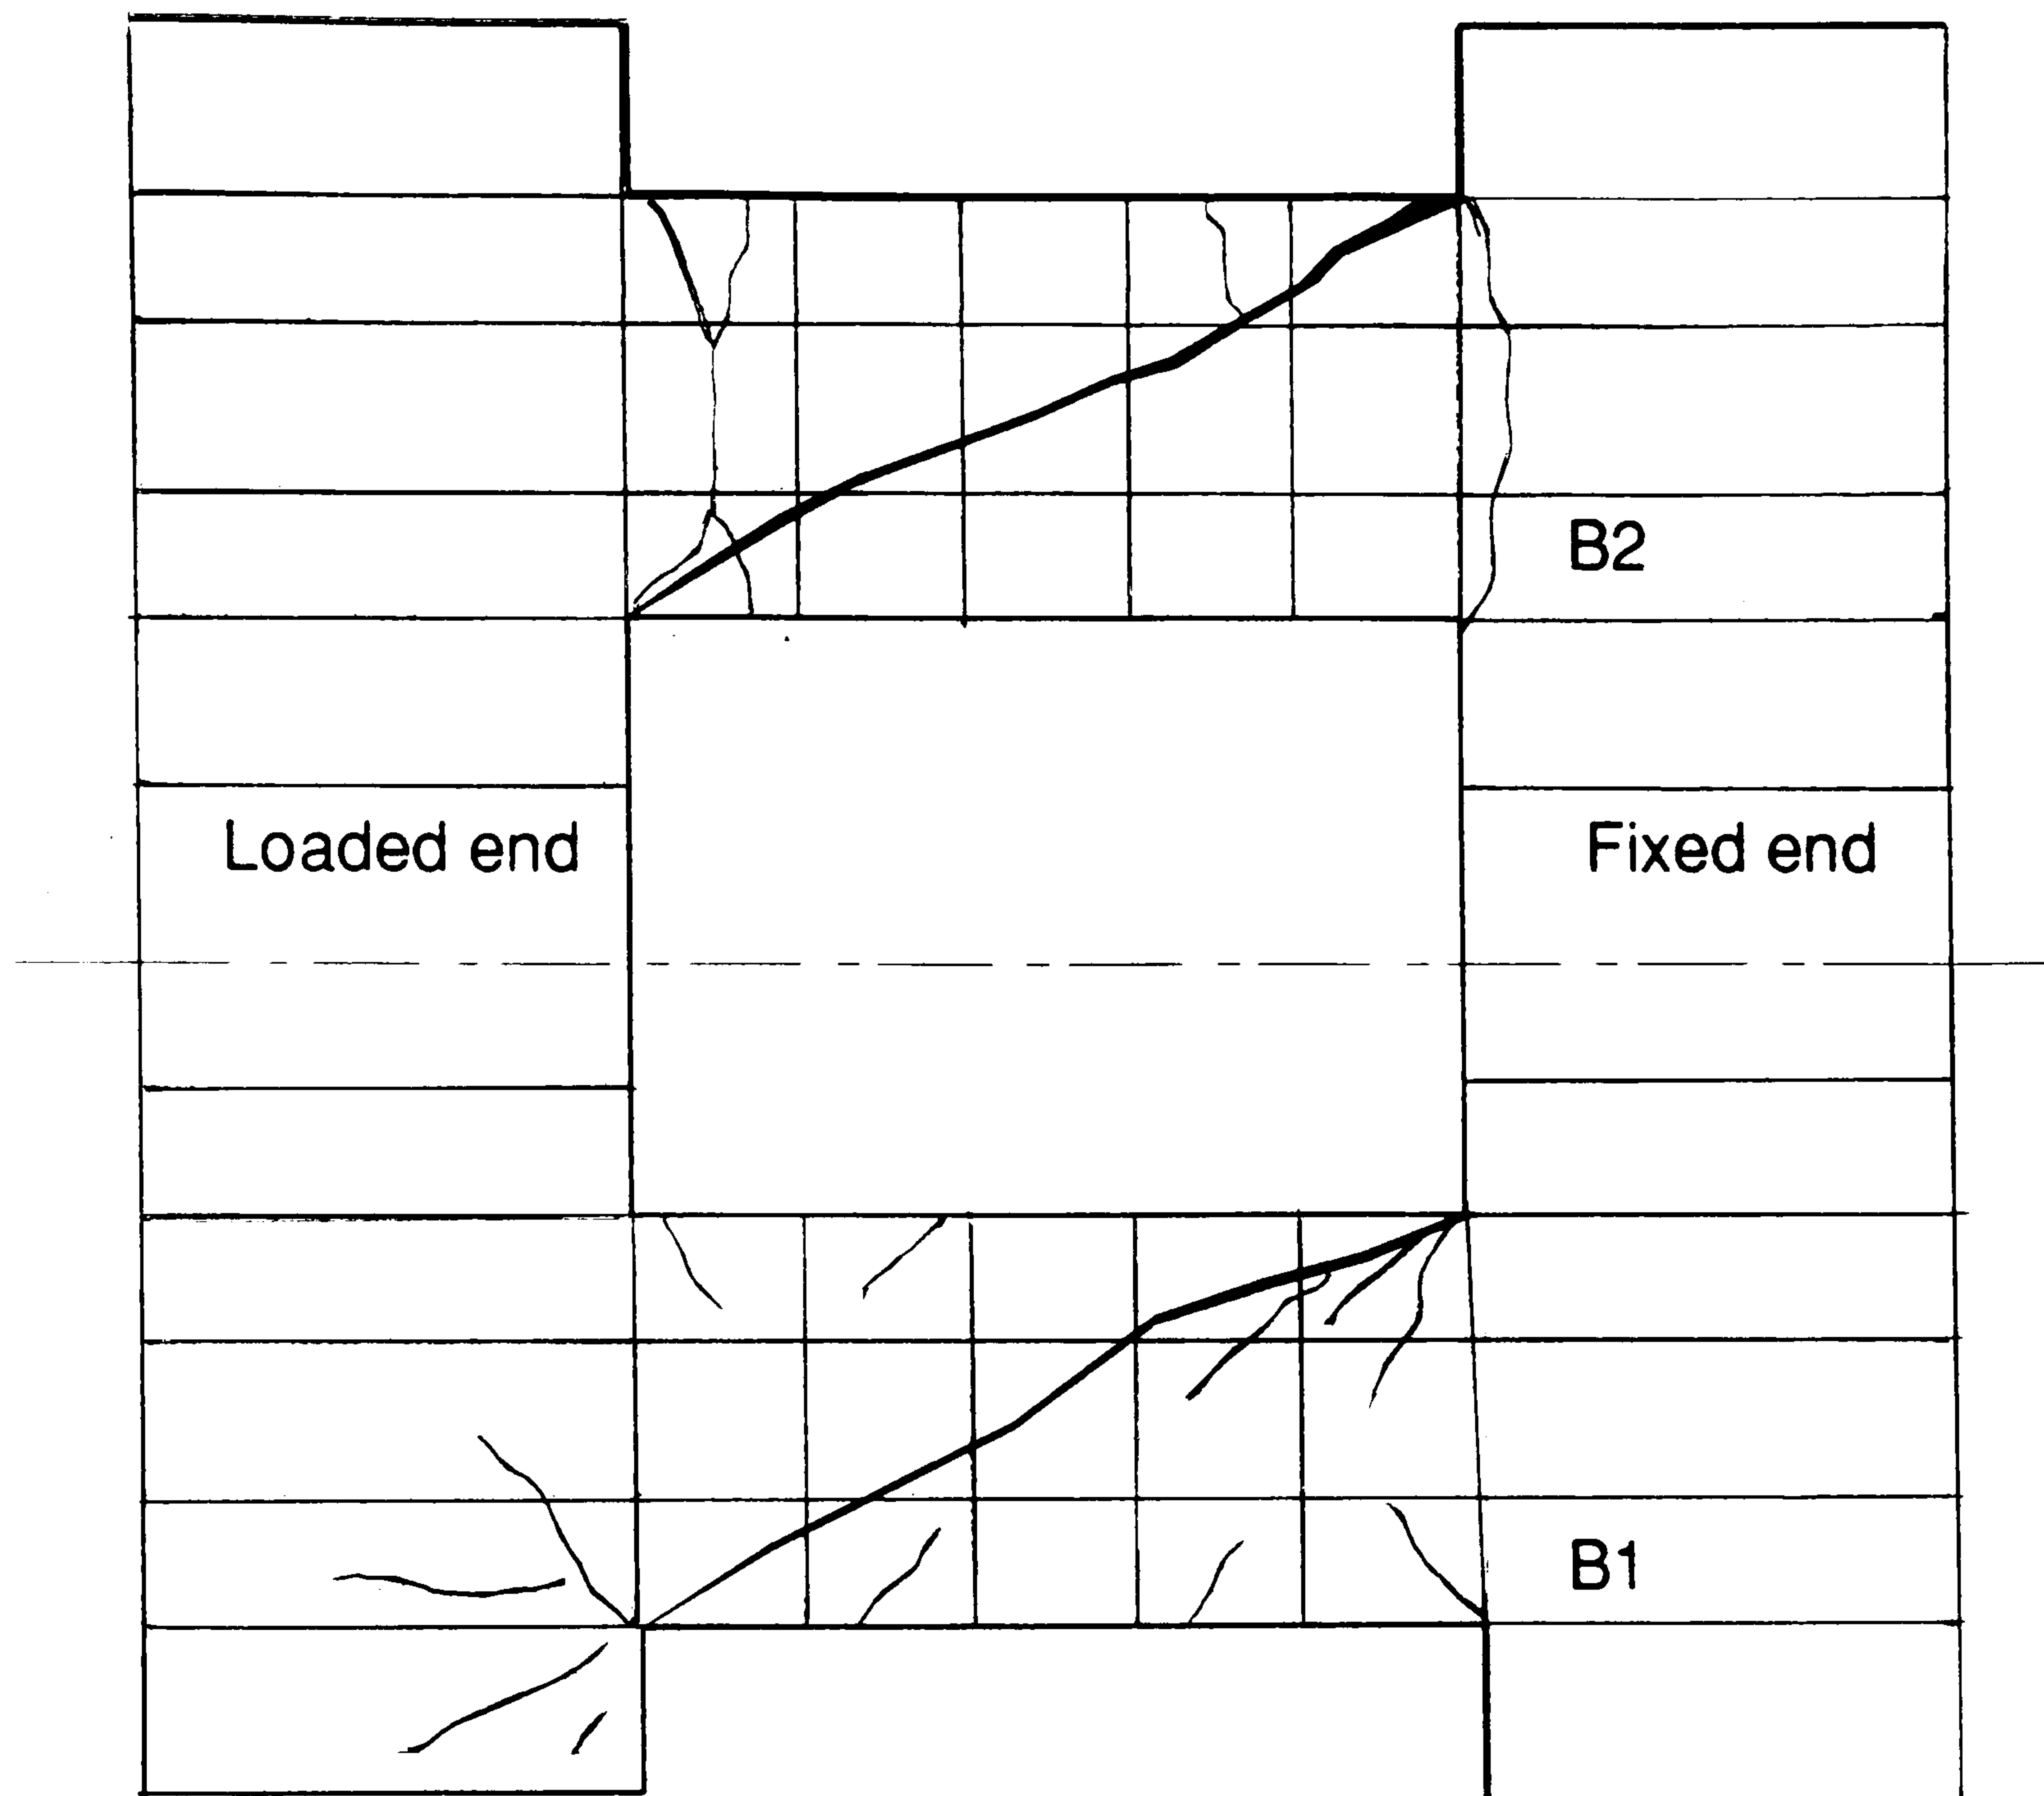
Failure mechanism and crack pattern for beam DBS2
